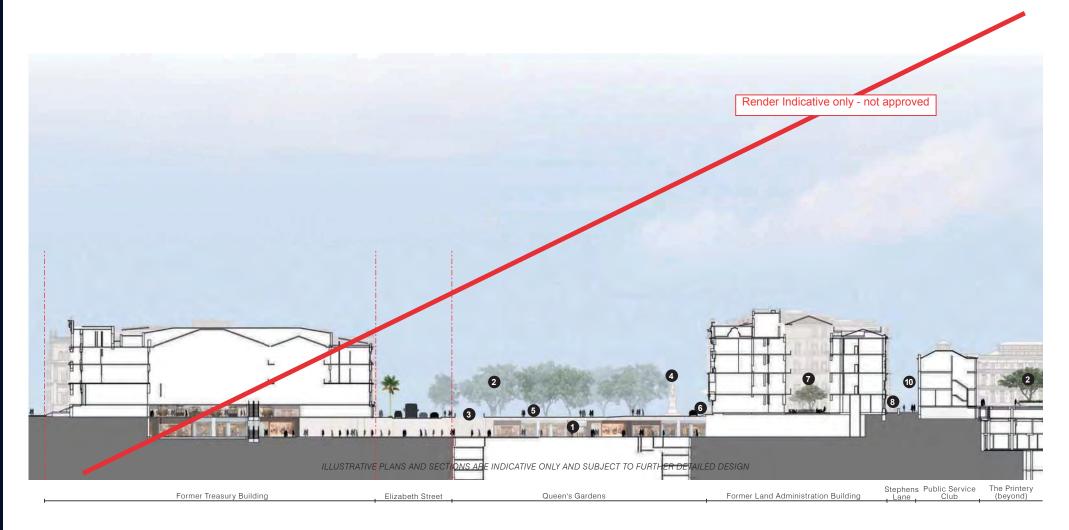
Sectional Elevation from George Street to the River (Not to scale)
